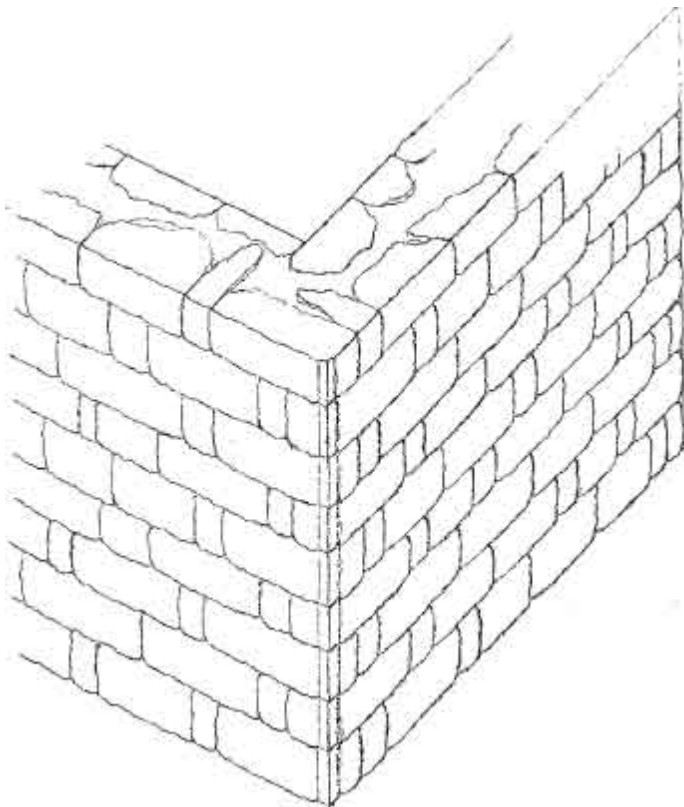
Sketch showing the principle of 'double corner bond' (drawing: P. Pedersen).
